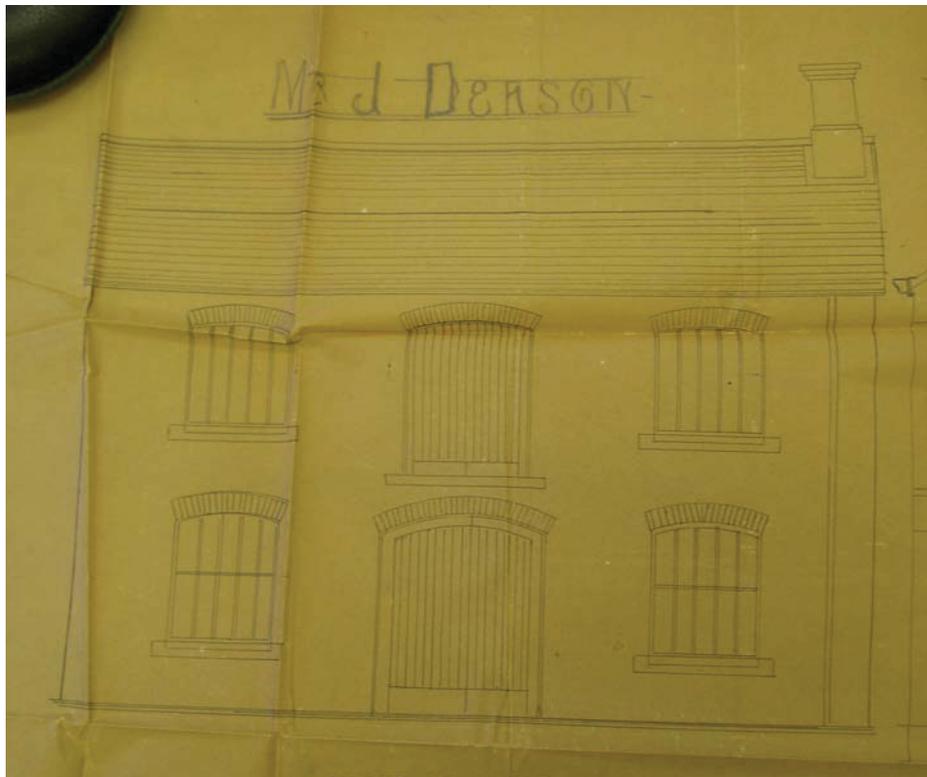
The front elevation of the workshop built for Deason's coachworks in 1878 (CRO(B) BSUD/U/BIPlans/269 1878)
